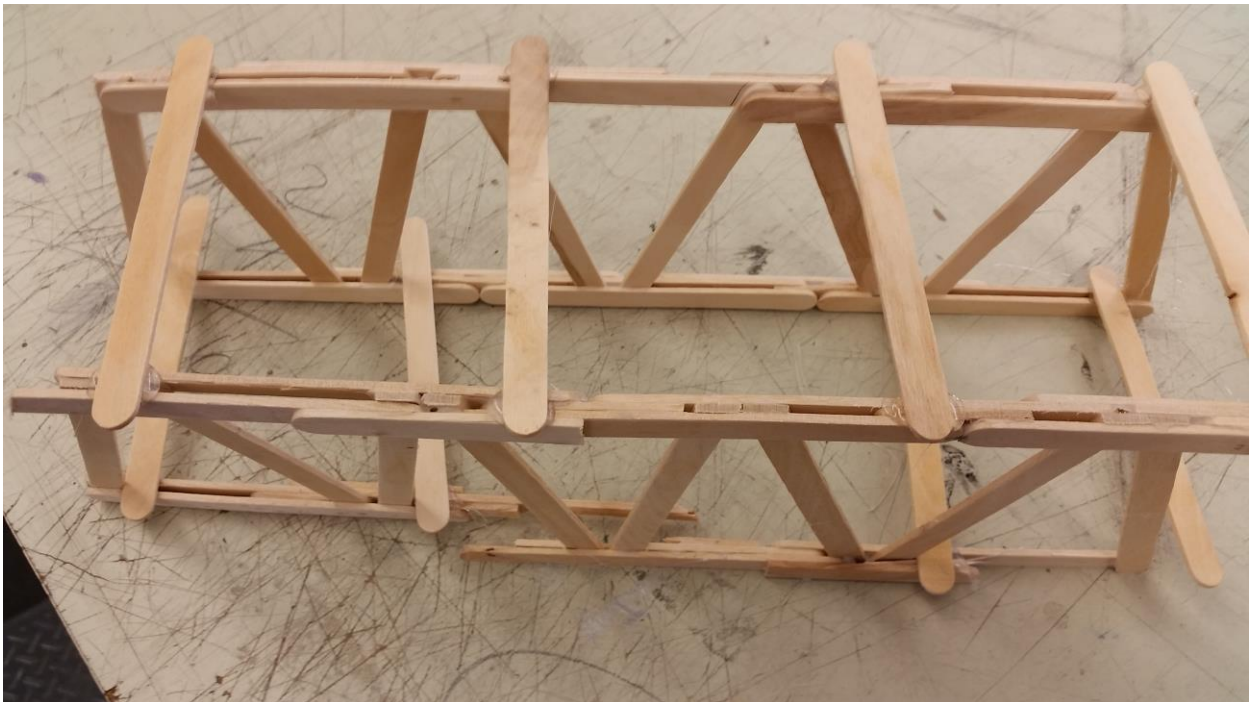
Warren Truss Bridge Prototype Failure after Load Testing
